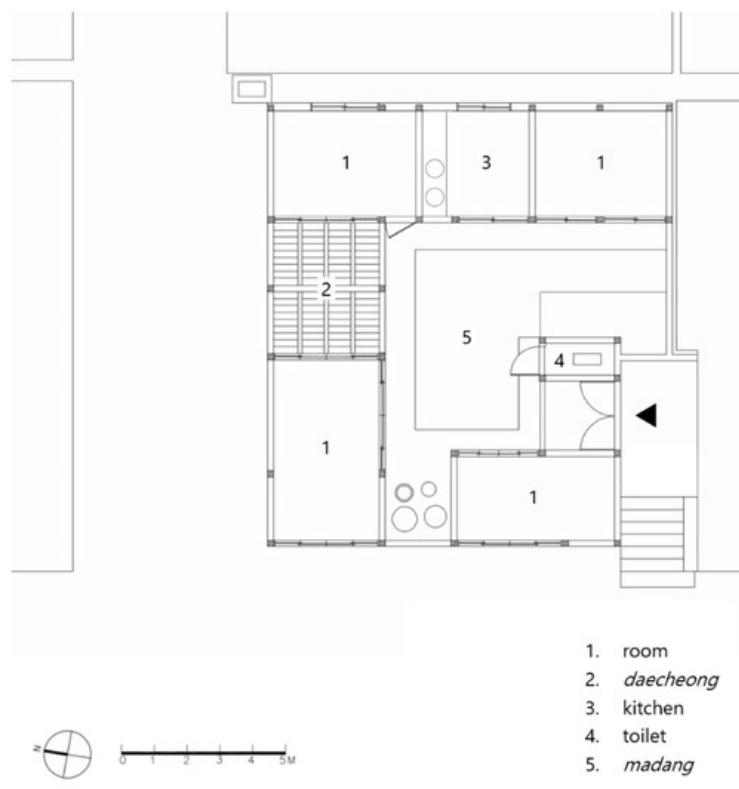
Plausible floor plan of the Samcheong Hanok when first built around 1940 (Drawn by the author).
